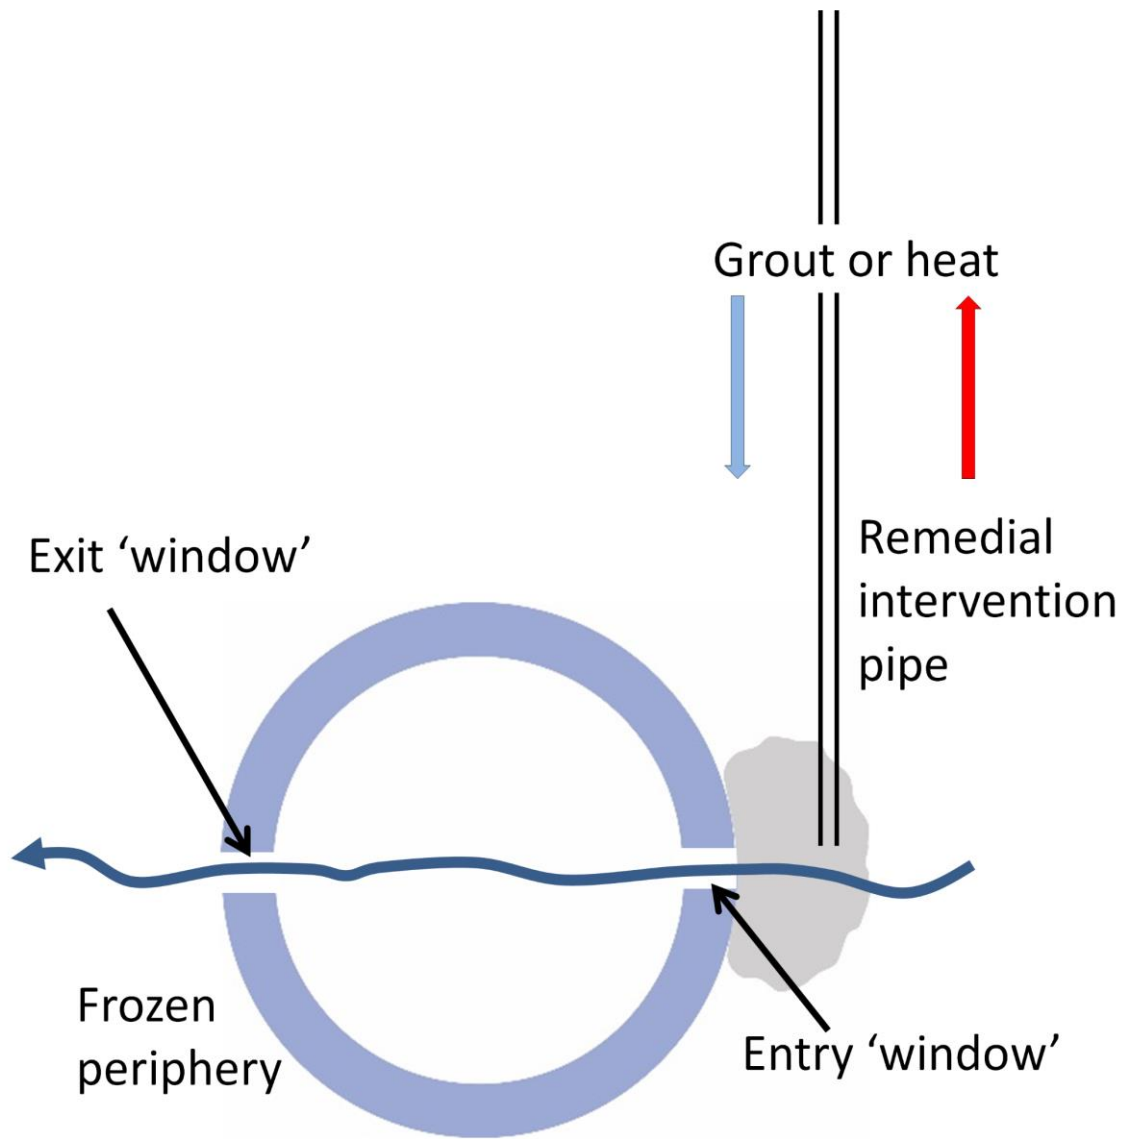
Altering ground conditions over a large area outside a window to encompass the high velocity groundwater flow regime.
